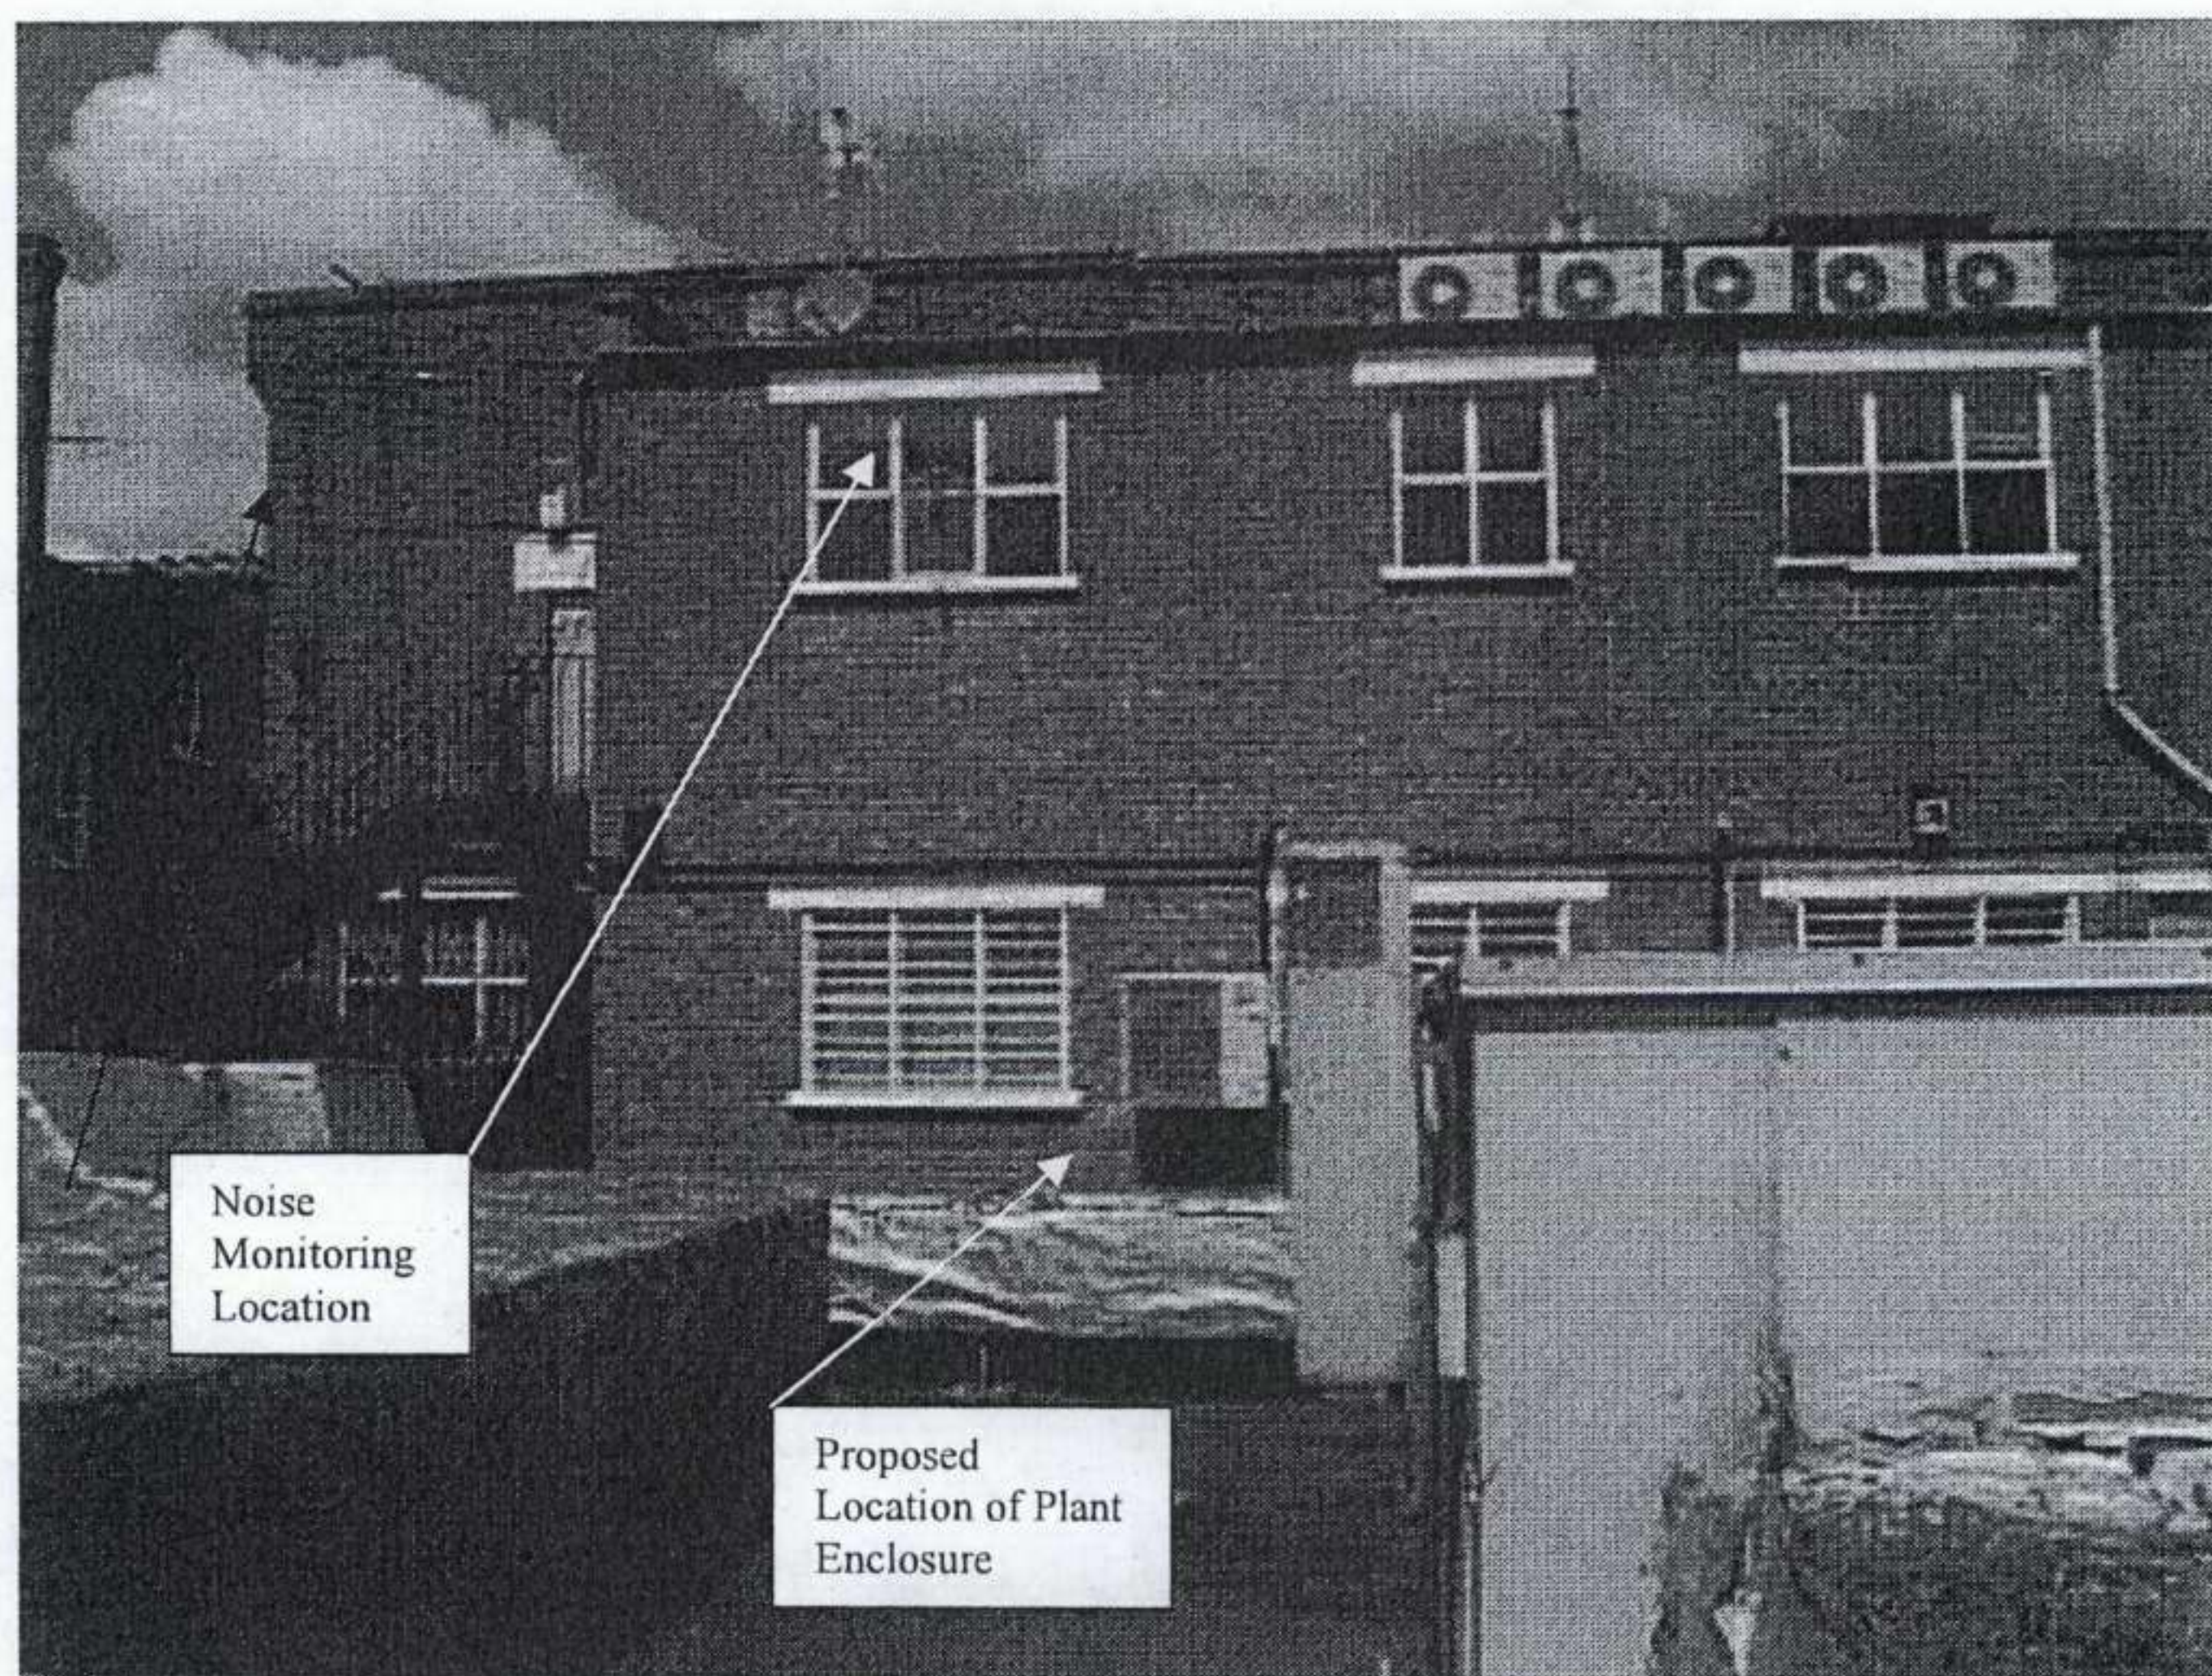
Noise Monitoring Location (3) overlooking the roof of the supermarket
